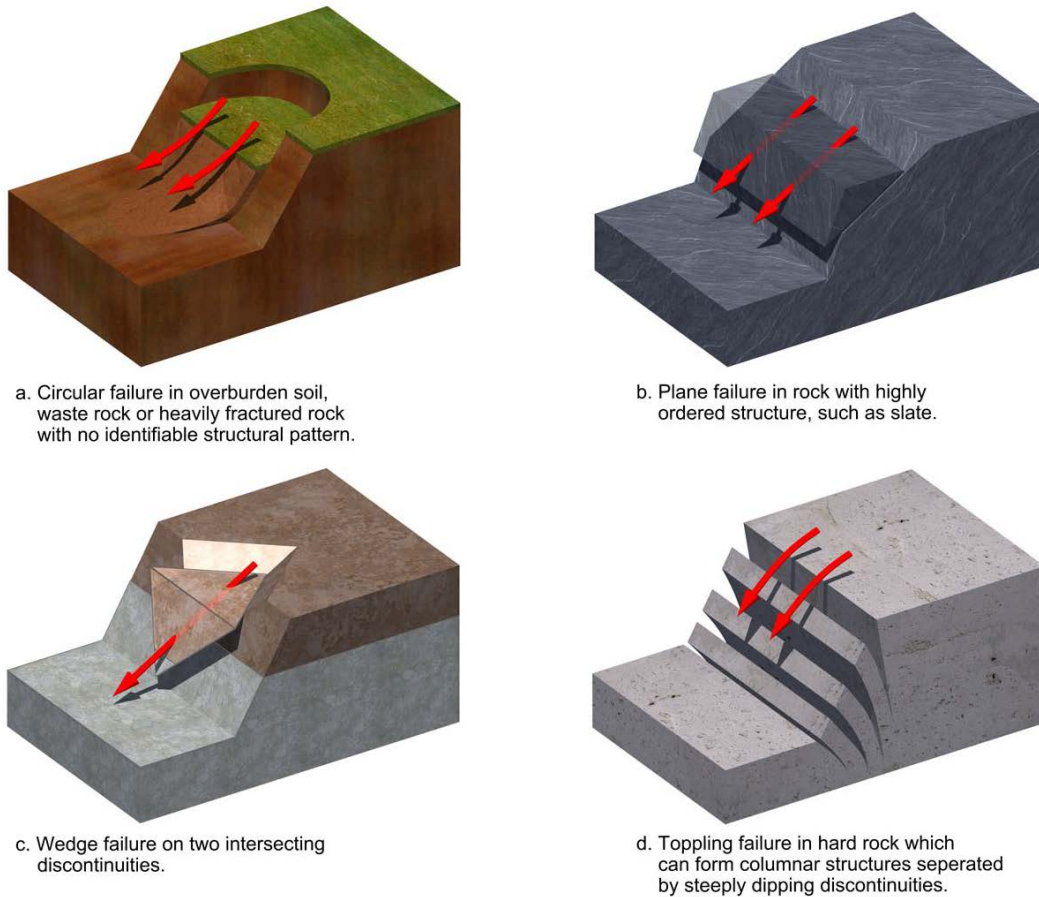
Rock Failure Modes Due to Structure within a Rock Mass.
